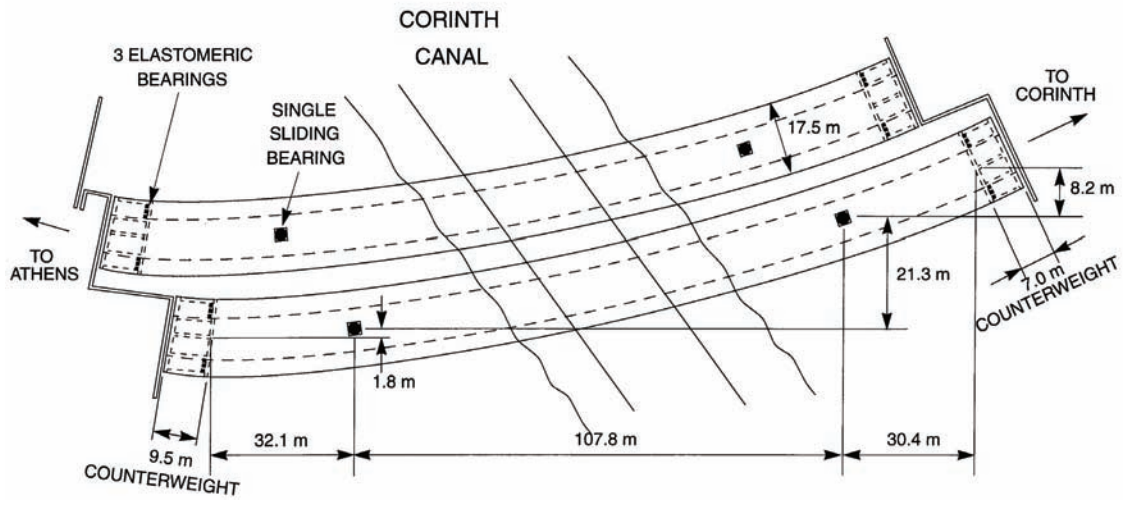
Plan and Elevation of Corinth Canal Highway Bridges
